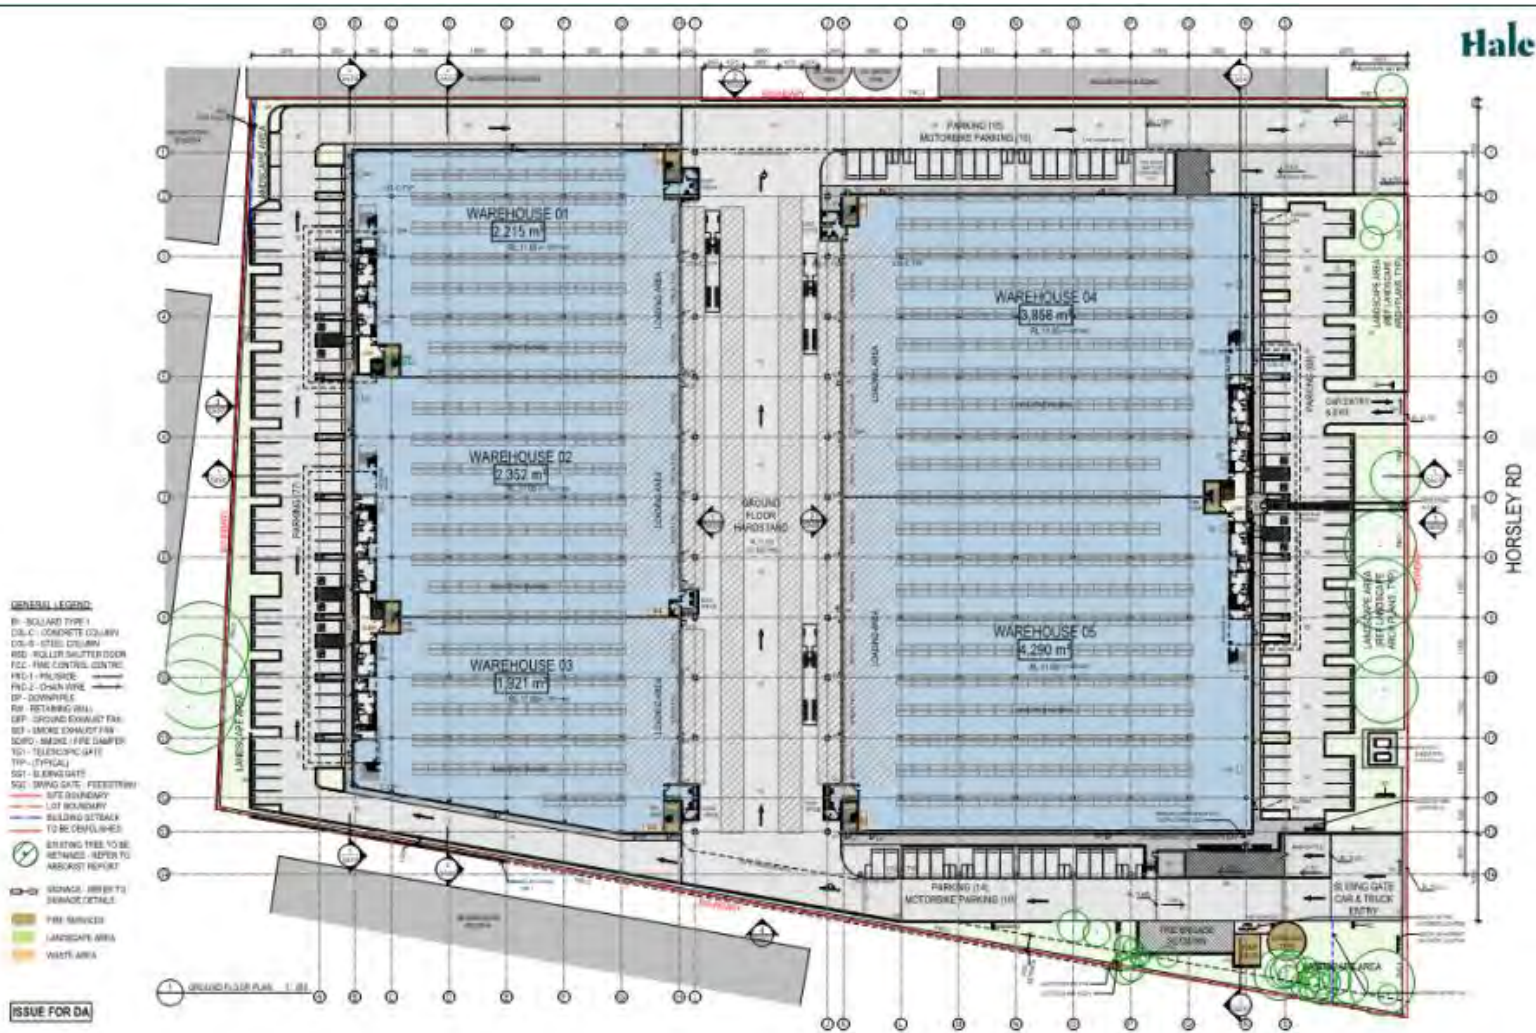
Proposed Site Plan (Source: SBA Architects, 2022)
